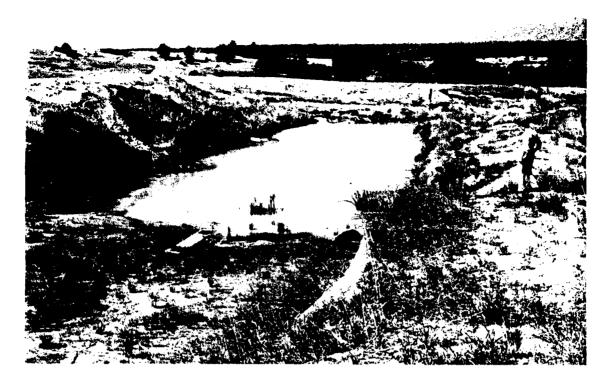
LANDFILL NO. 1 - OPEN TRENCH
